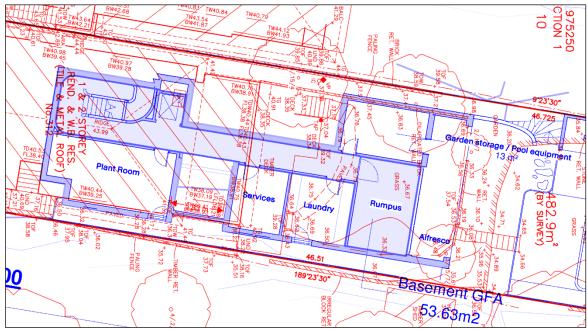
Applicant's submitted Basement Floor Plan overlayed with the Survey Plan by Assessment Officer to determine existing floor levels.
